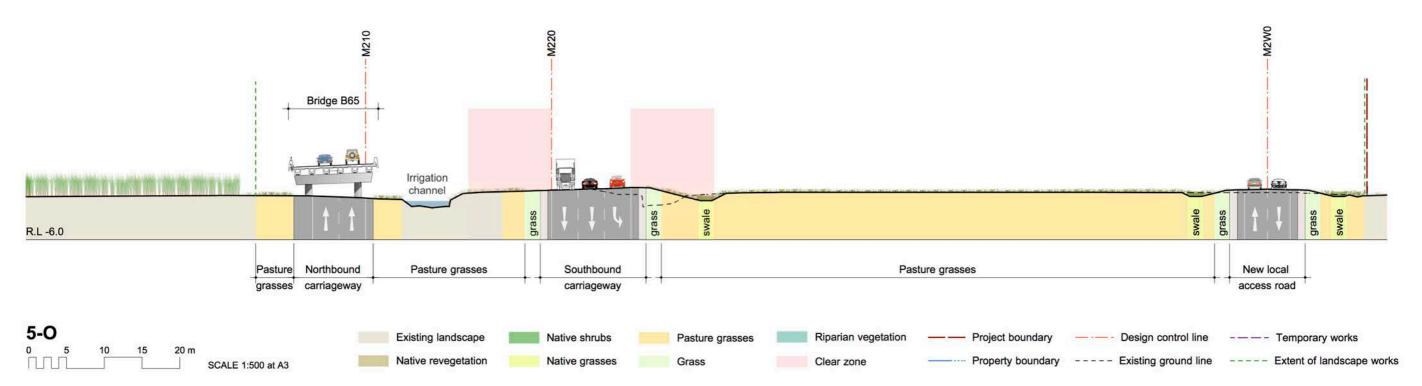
Section 5-O at Bridge B65 – Northbound Bridge for Clarence Floodplain Opening 17
